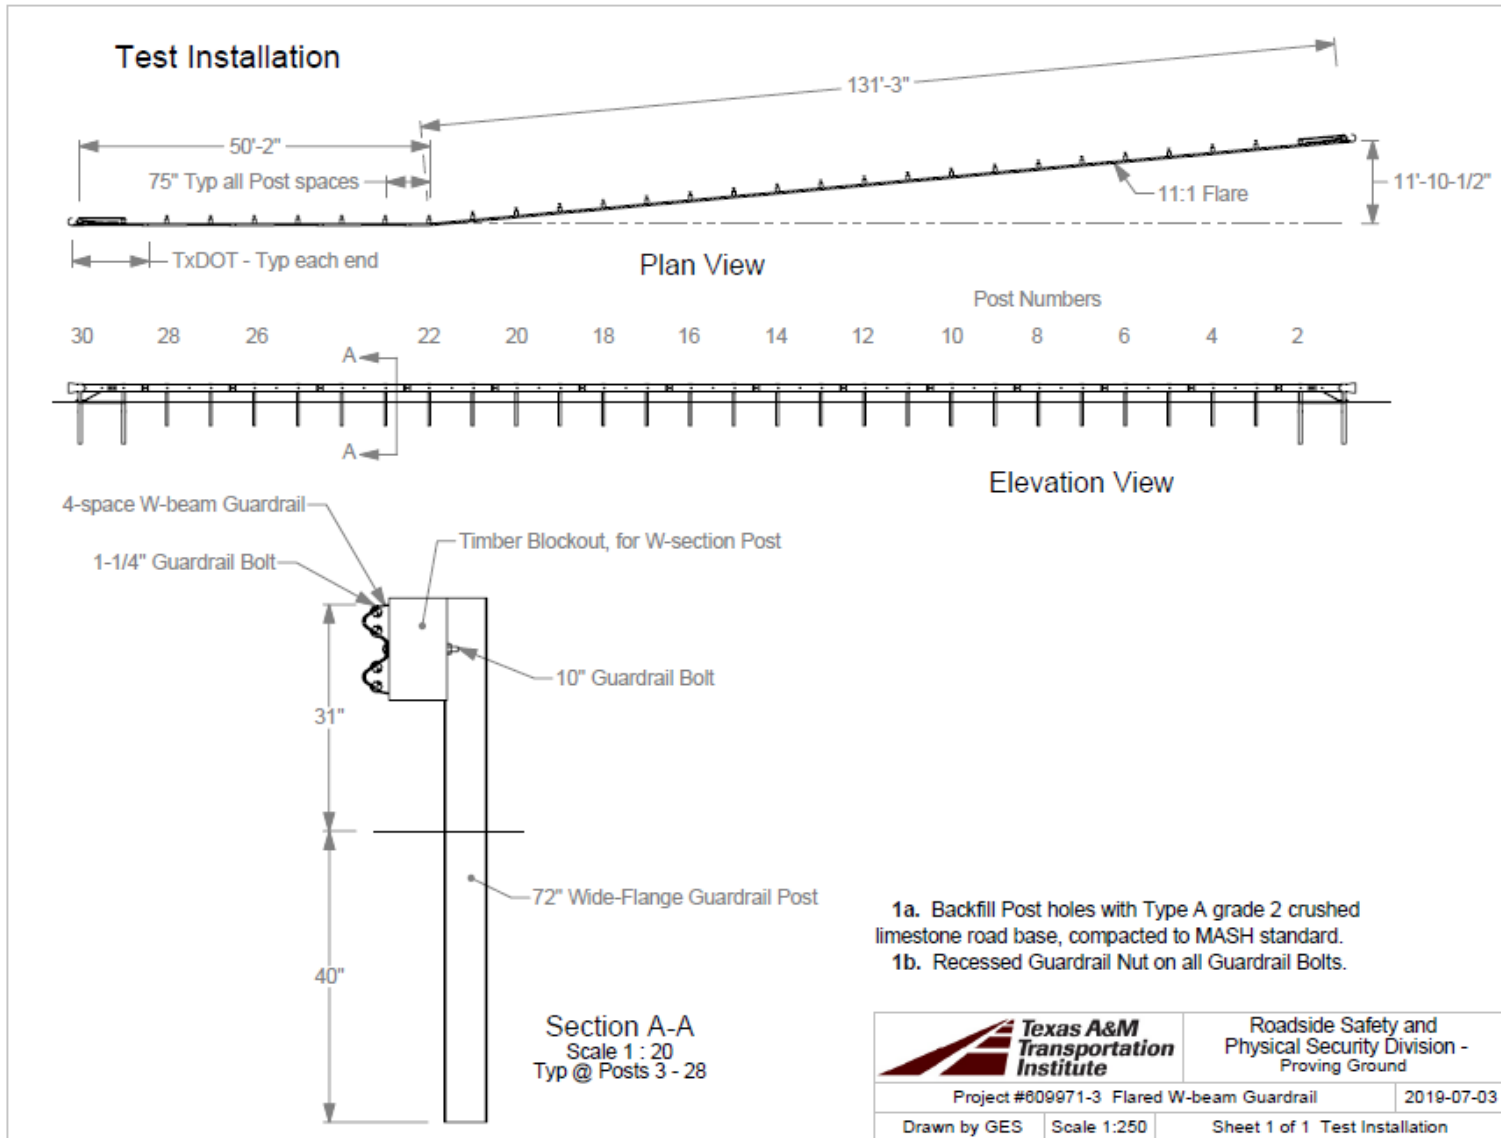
Details of MGS Guardrail with 11:1 Flare.
